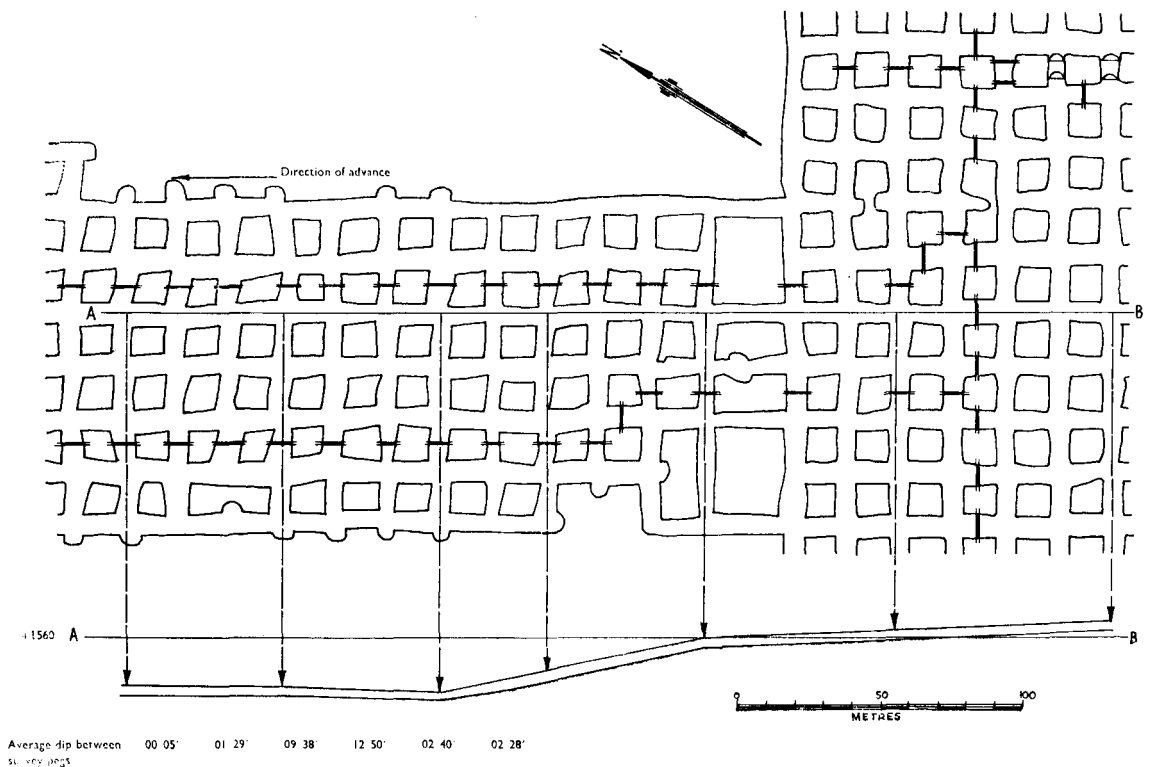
Plan and section of Section 5/6 on No. 2 seam, Greenside Colliery
